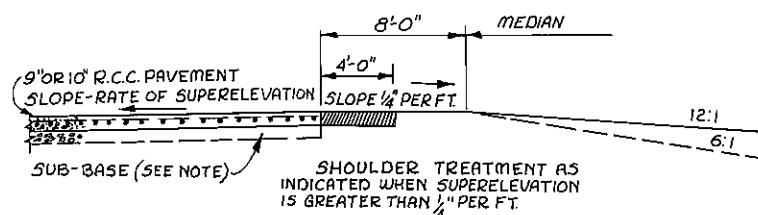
DETAILS TO BE ALTERED AS REQUIRED FOR FLEXIBLE TYPE PAVEMENT.
